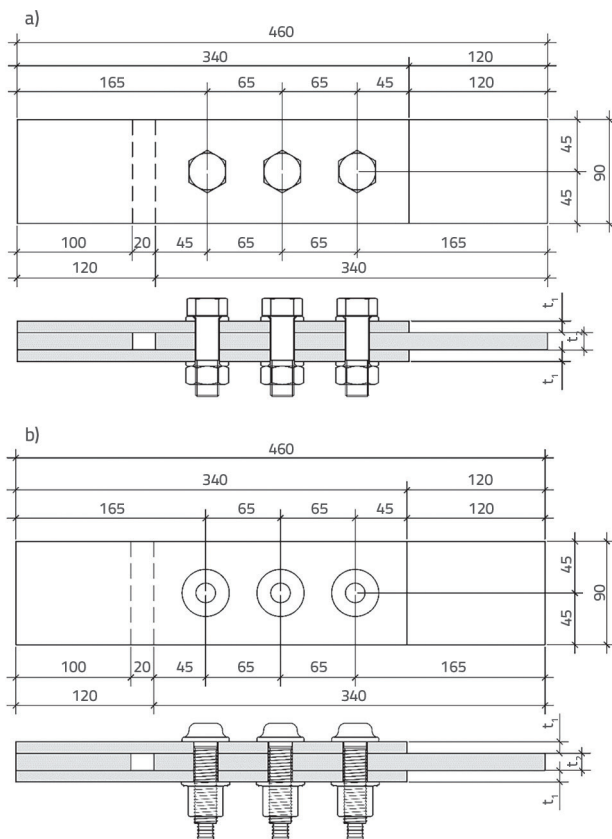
Nominal geometry of specimens with HBT bolts: a) Specimens with HV bolts; b) Specimens with HBT bolts (all dimensions are in mm)
